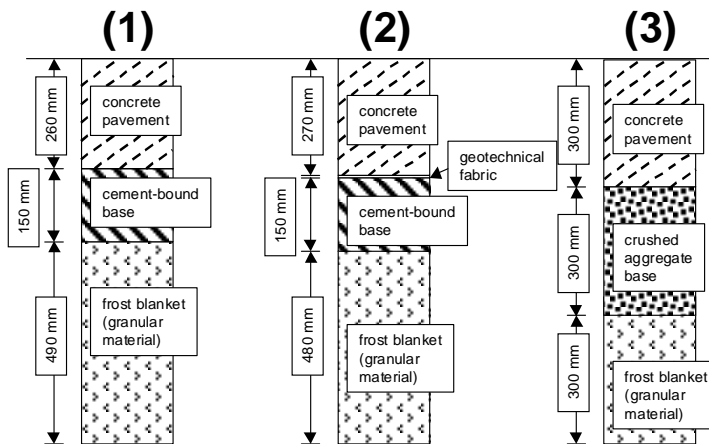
Alternative designs of concrete pavements for German expressways for heaviest traffic loadings and a frost-proof pavement structure of 900 mm:
